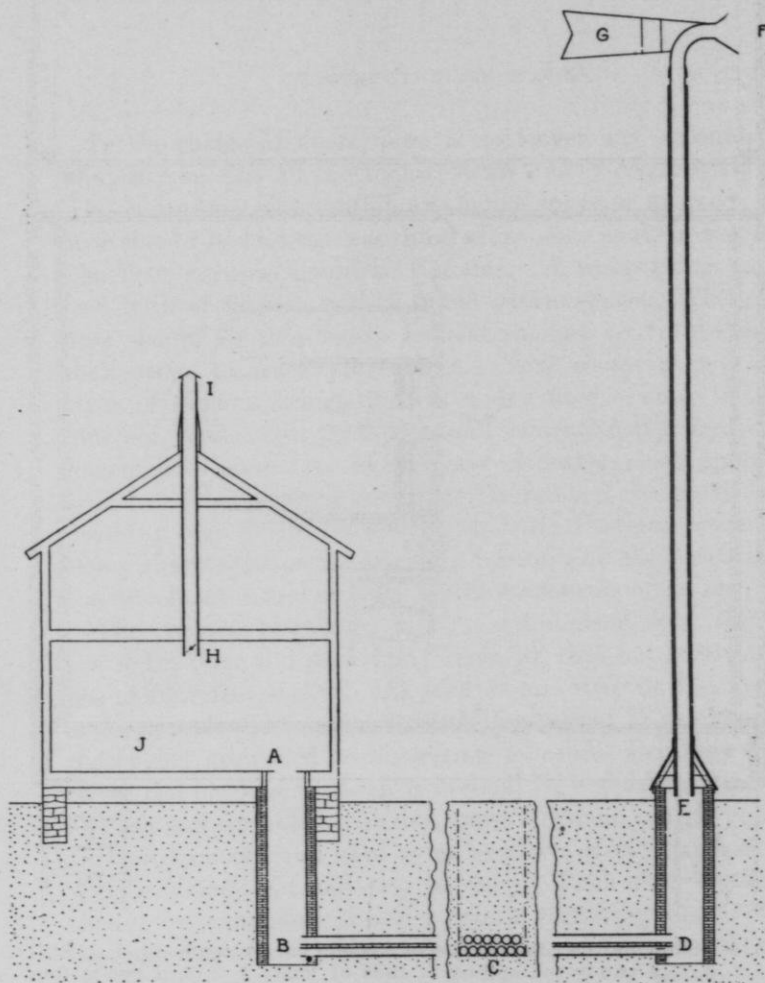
Section of cheese curing room and horizontal sub-earth duct. A, inlet to curing room; B, end of sub-earth duct in bricked entrance to factory; C, cross-section of the multiple ducts. D, E, bricked entrance under funnel at outer end of sub-earth duct; F, funnel with mouth 36 inches across; G, vane to hold funnel to the wind.
